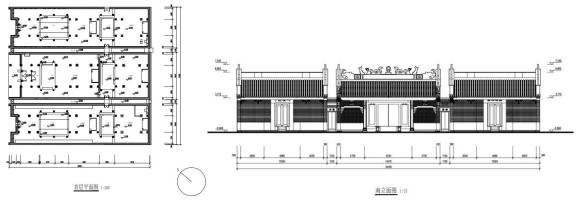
Left: First floor plan of Renwei ancestral temple Right: Front elevation of Renwei ancestral temple
